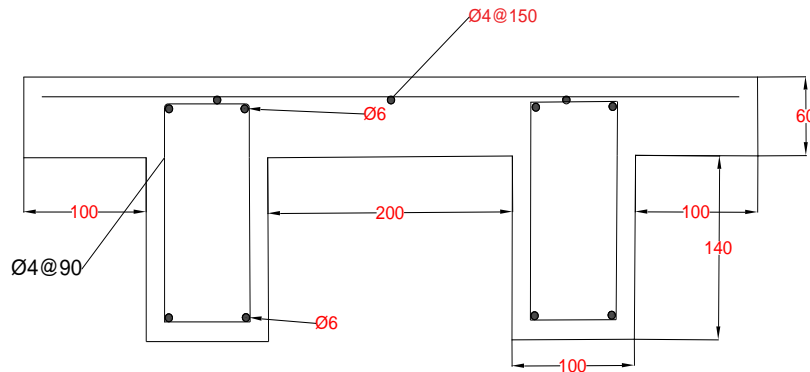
Dimensions and Reinforcement Details for All Tested Ribbed Slab.
